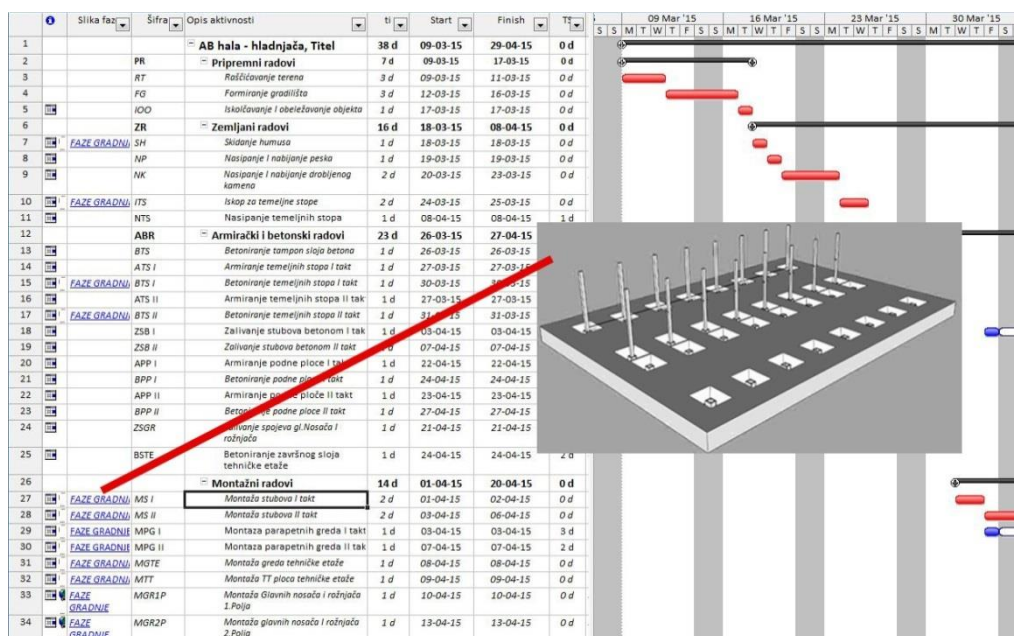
Work plan in MS Project and 3D prefabricated construction model
